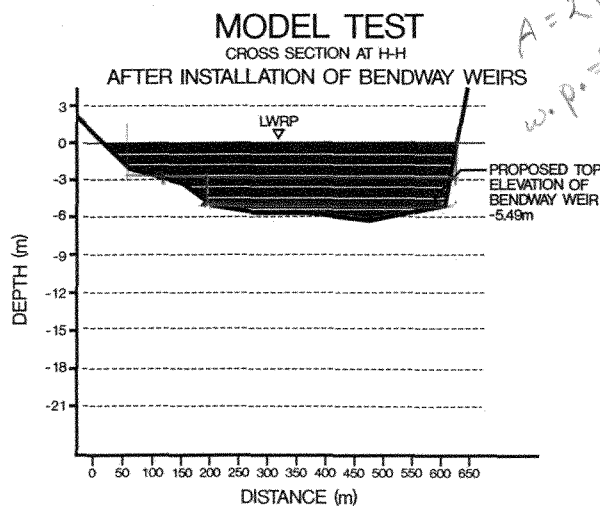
Cross-sectional plot of bendway weir plan at H-H
